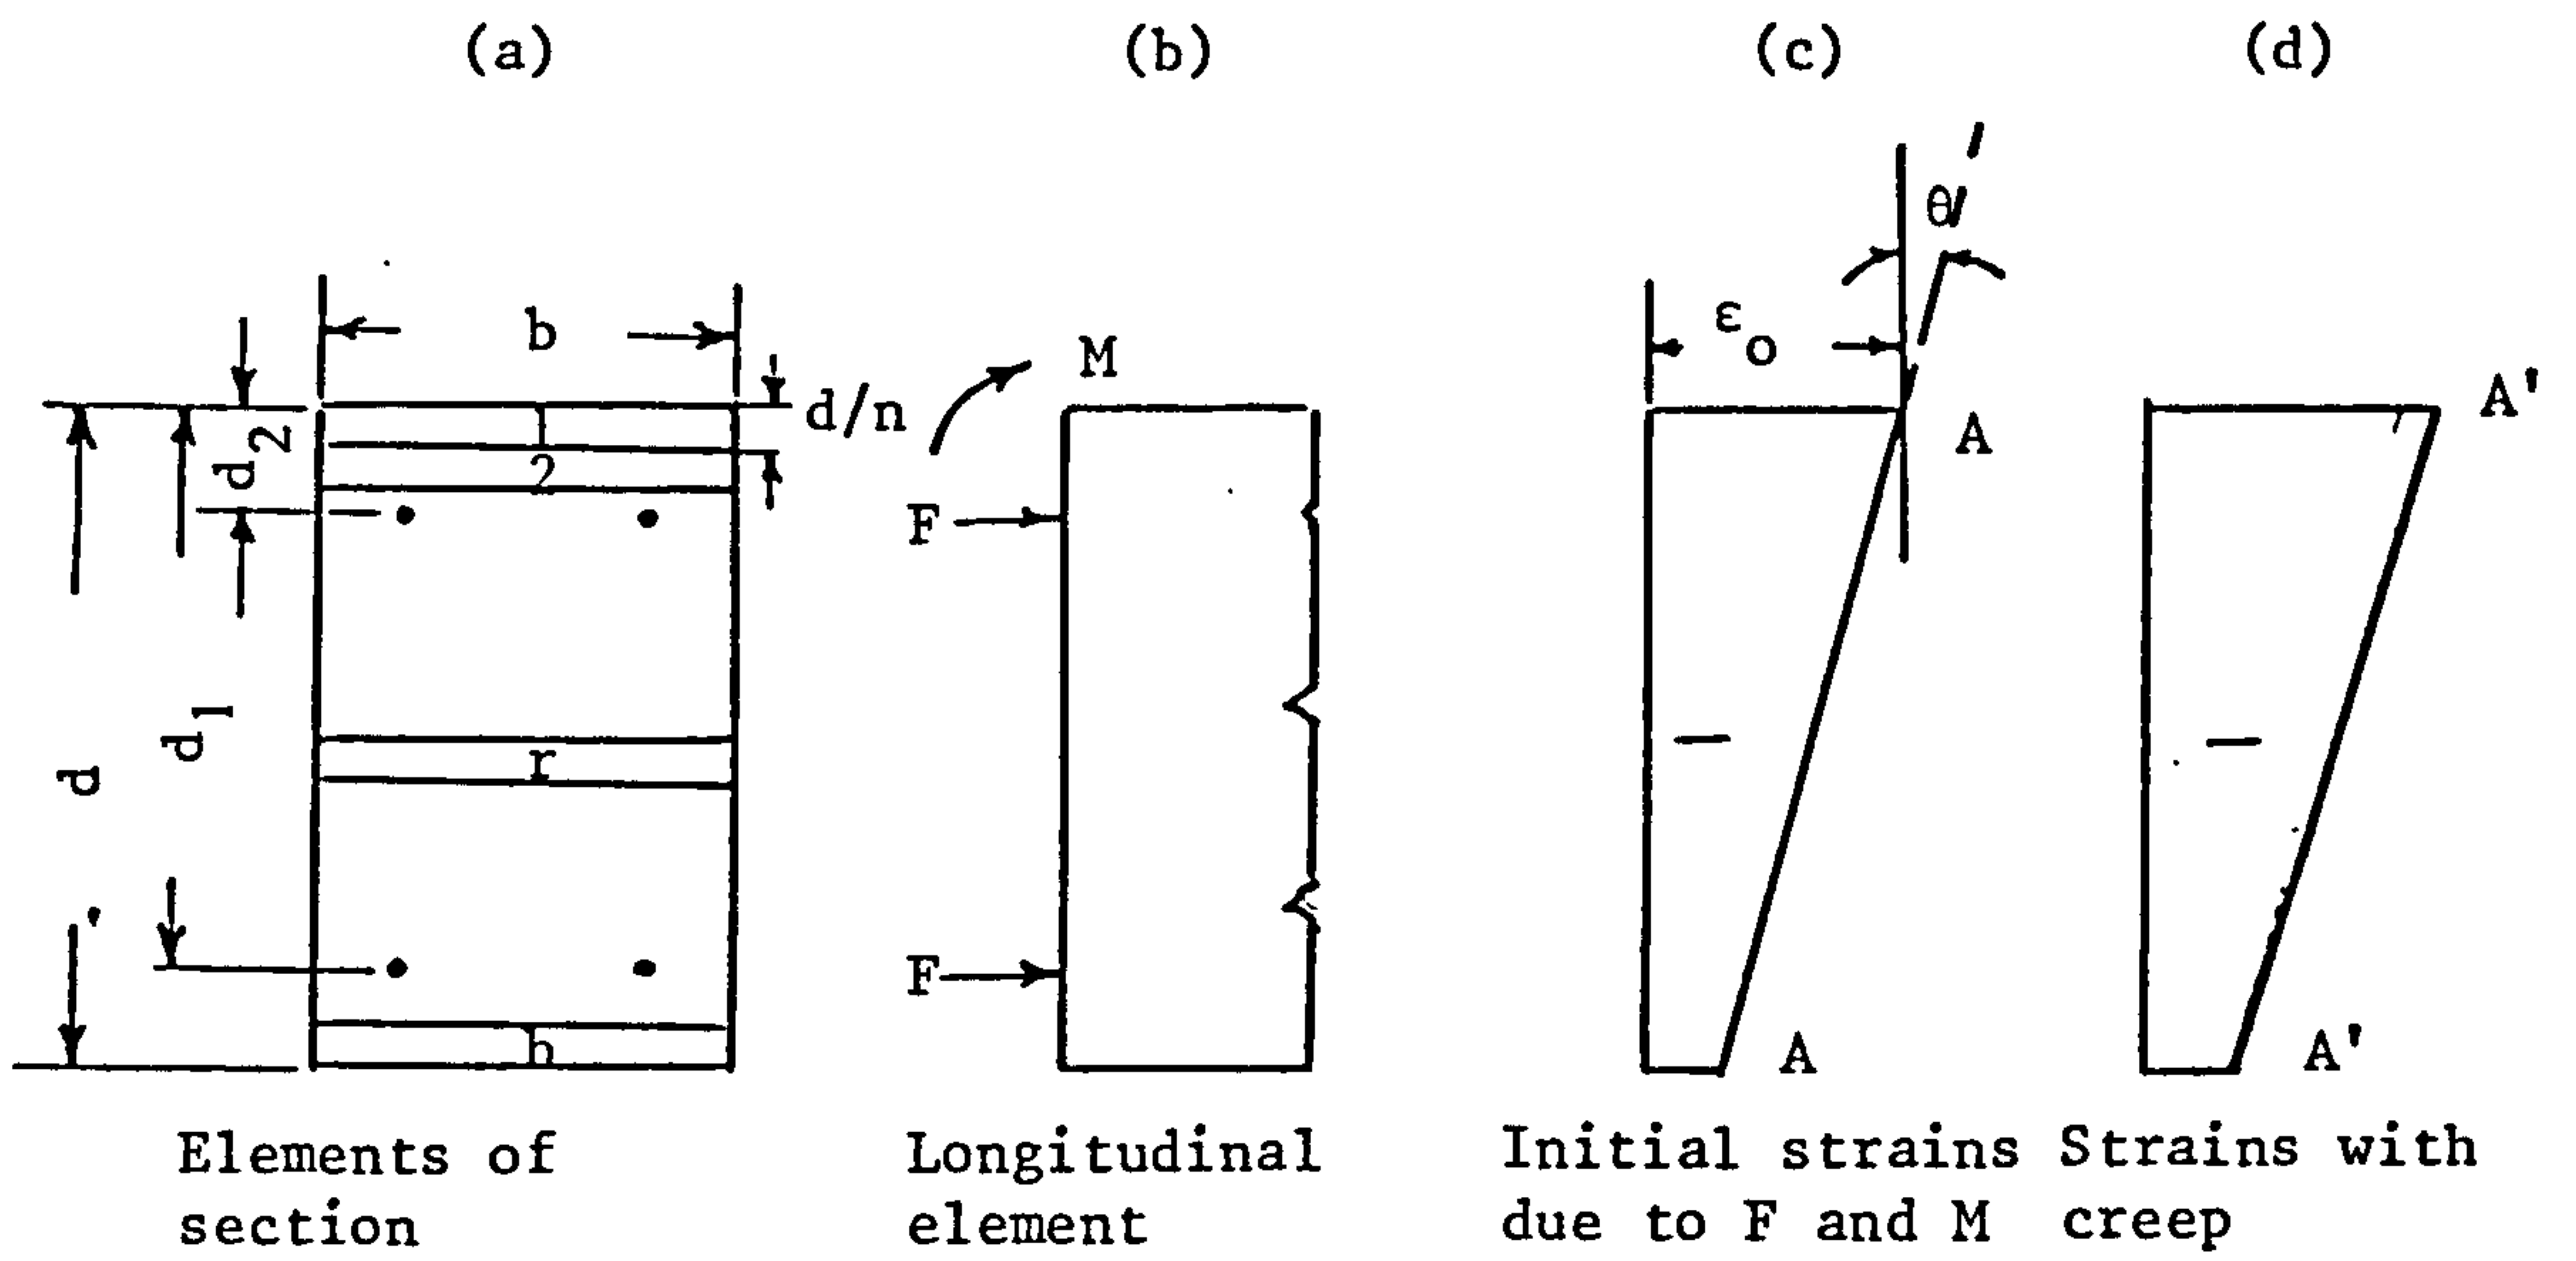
Strains in prestressed concrete beam by the Effective Modulus Method
